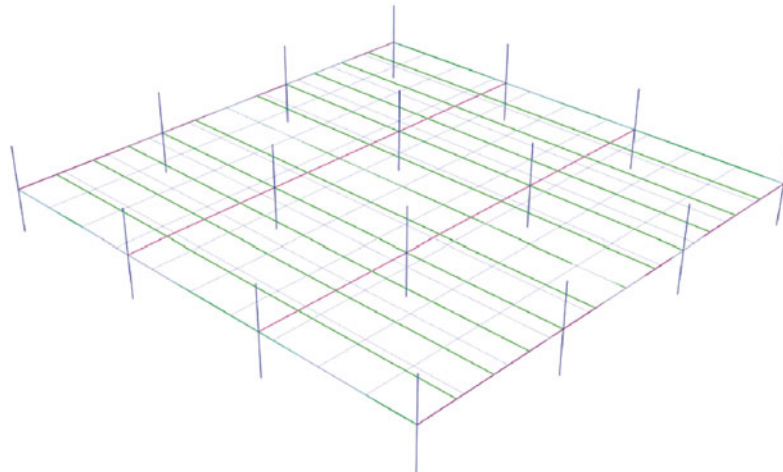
Three beam steel model construct in Rhino 3D designing software
